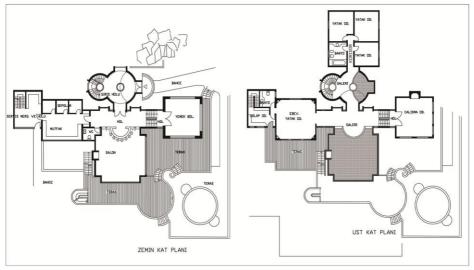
The modular system of the plan layouts, Bodrum Simavi House, 1980.
